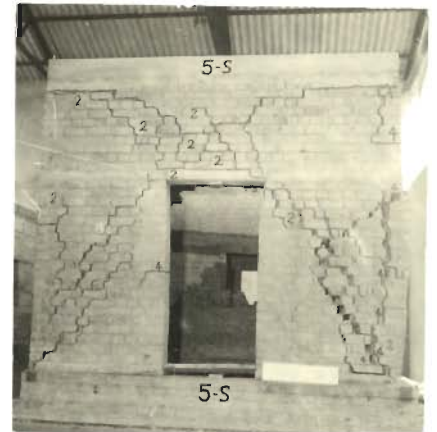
SEVERE DAMAGE IN SOUTH SHEAR WALL (MODEL 5)
